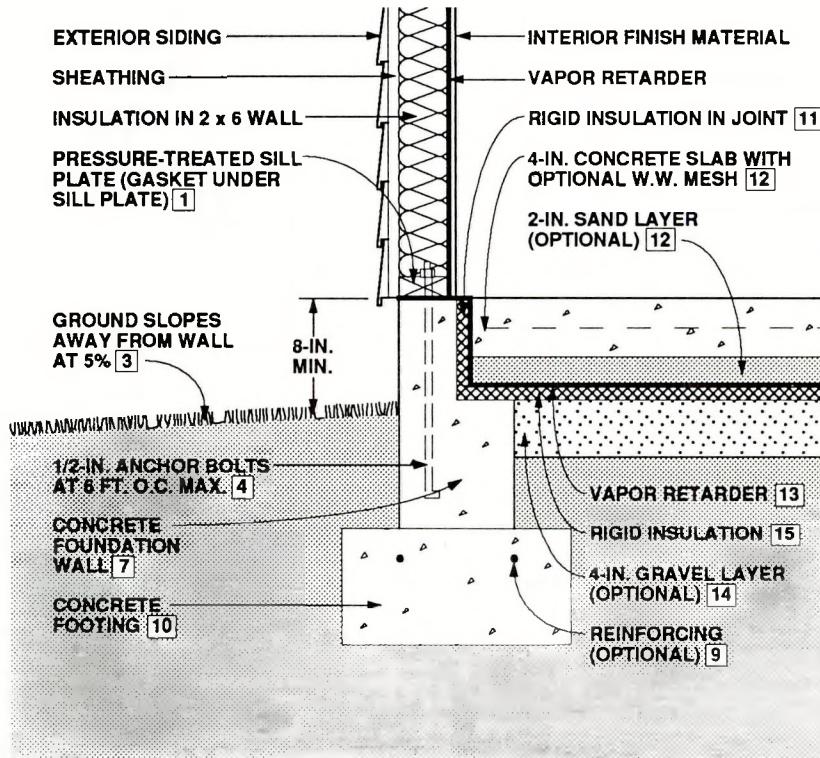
Slab-on-Grade with Concrete Wall (Insulation Under Slab)
